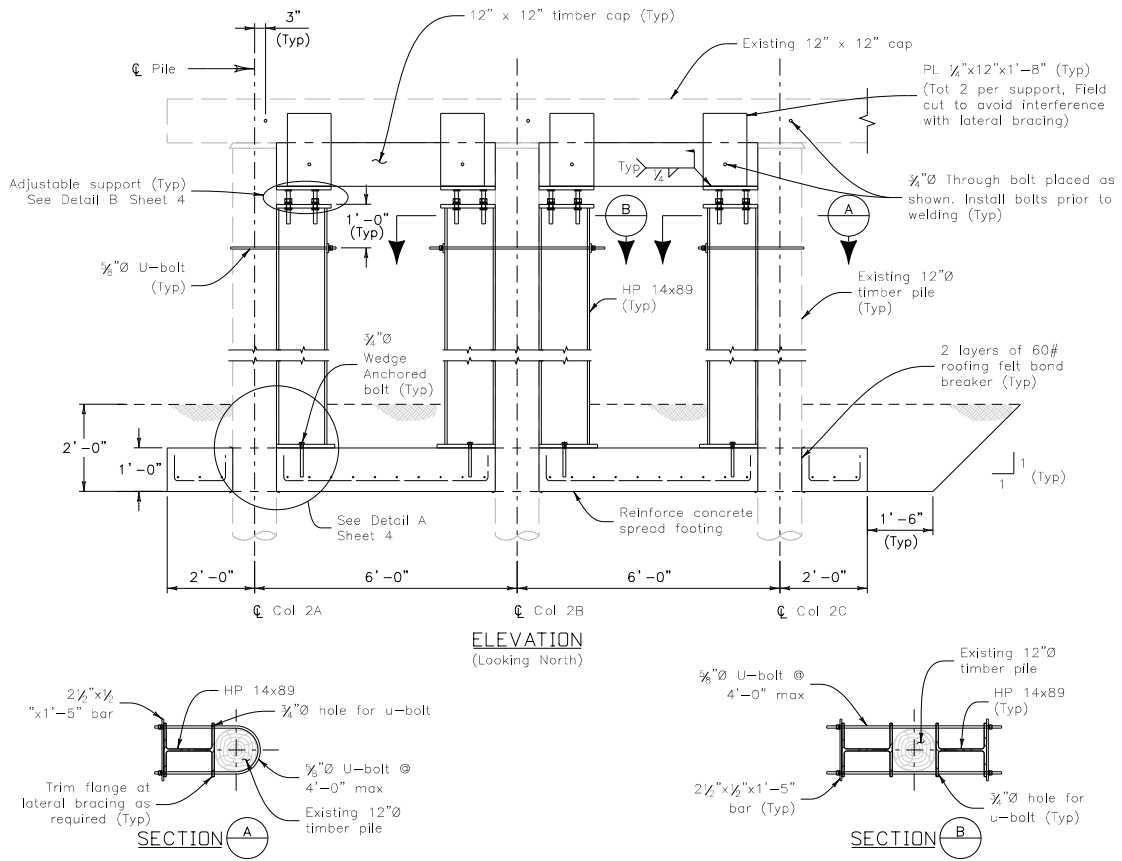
(G)-5 Sample of Adding Columns to a Pile
